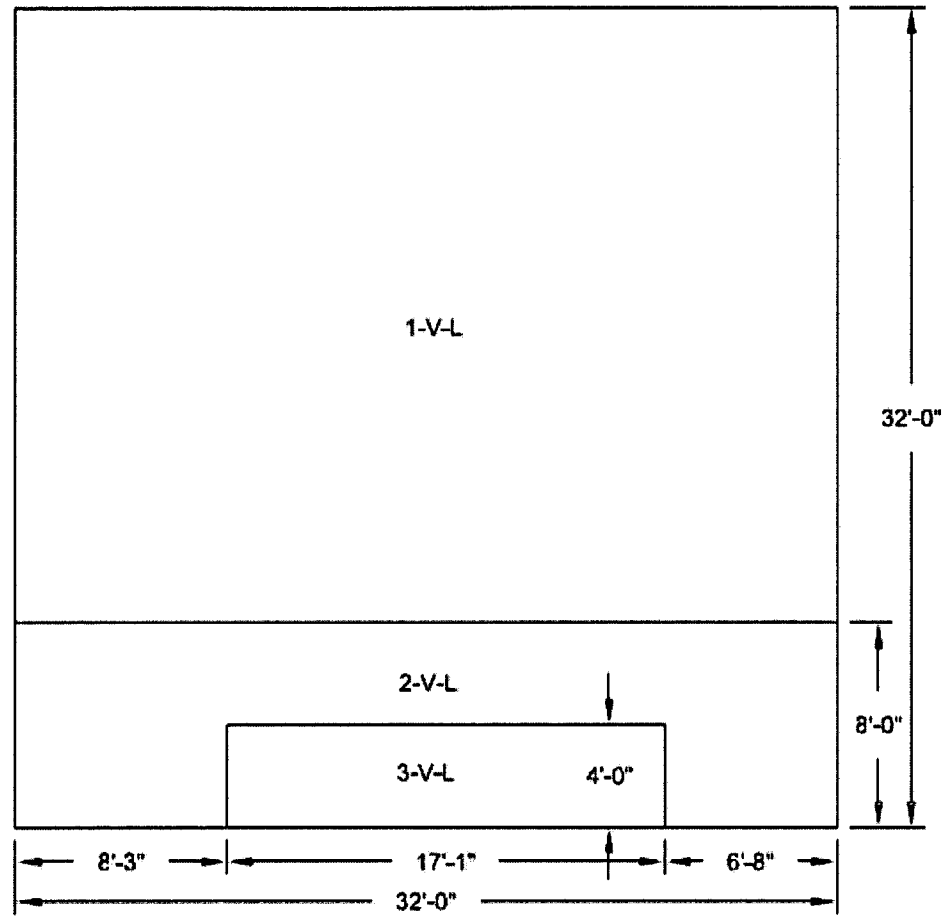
H.6-186 Wall 12 Looking From Outside Vertical Reinforcement Zones
